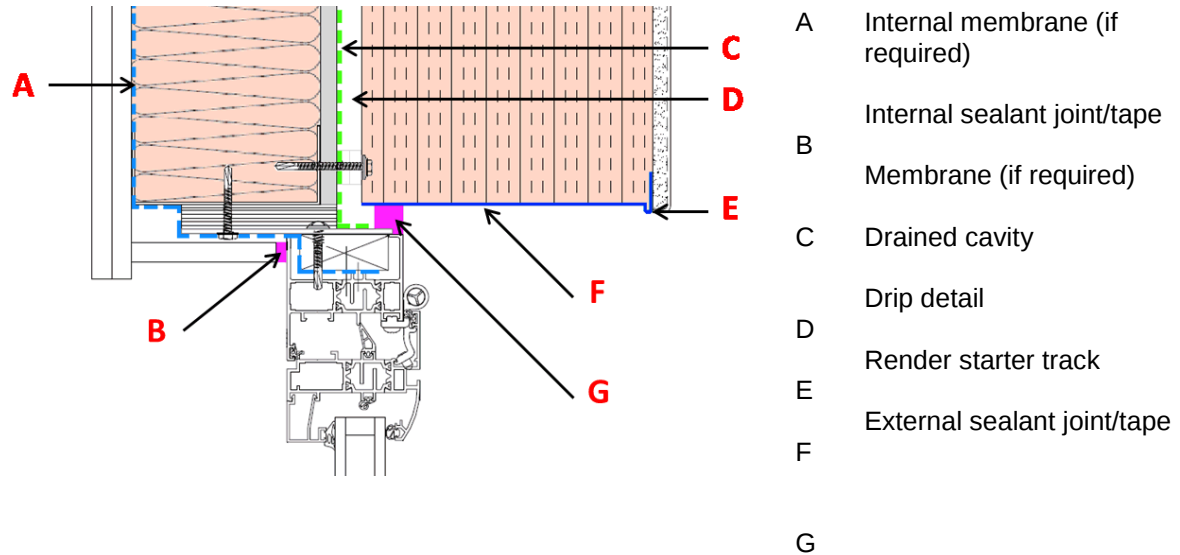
Window head interface with EWIS, framed back wall (insulated)
